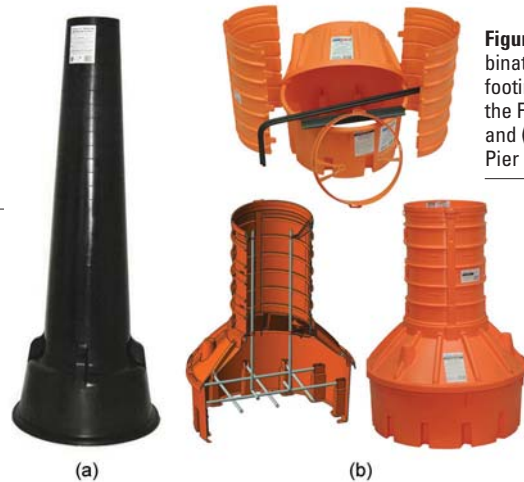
Combination pier and footing forms: (a) the Footing Tube™, and (b) Fail Safe Pier Footer.
